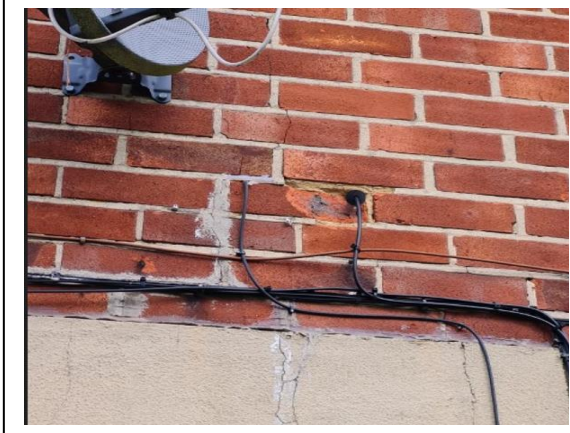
Front Elevation – Cracking above Ground Floor Right Window- Note evidence of previous repairs
